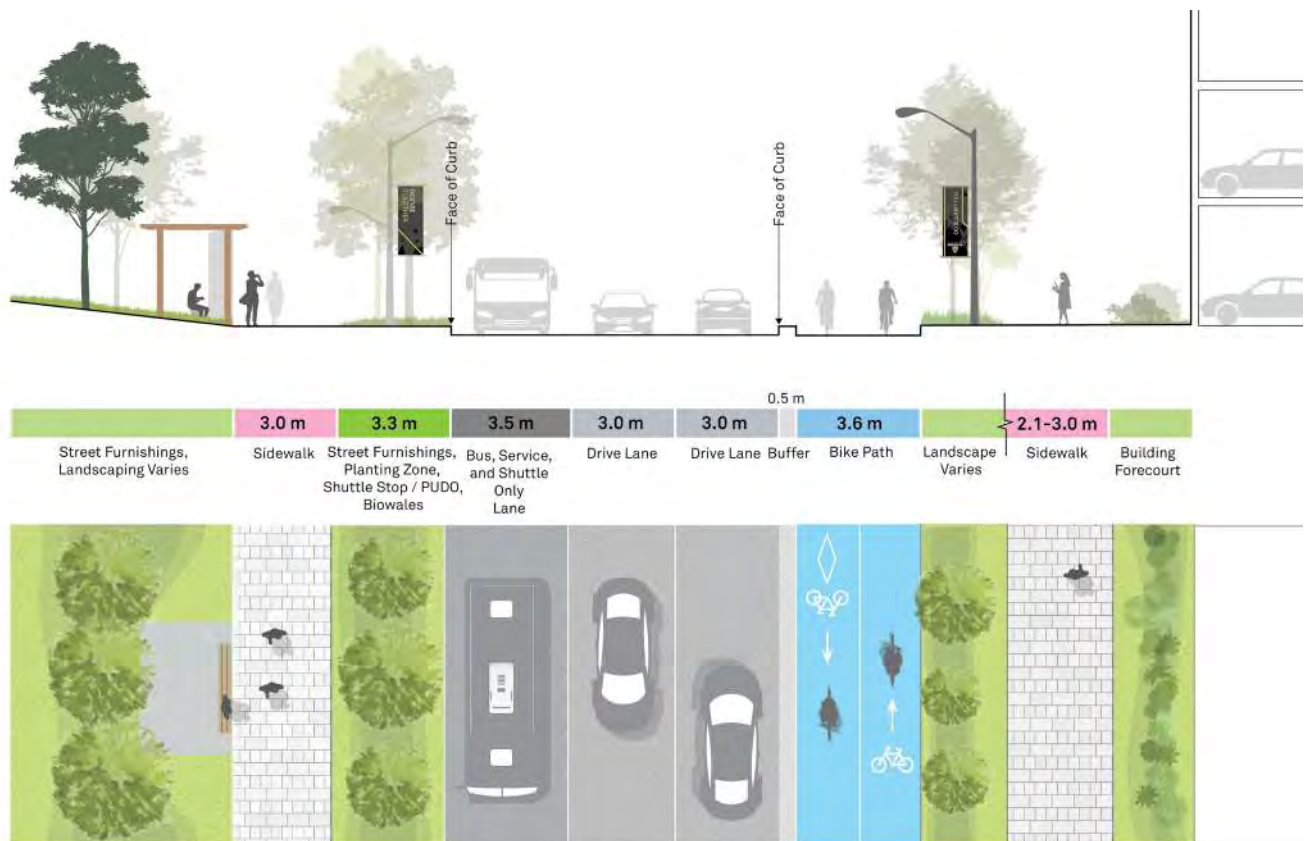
Section F. Proposed condition of Ring Road (southern edge).
